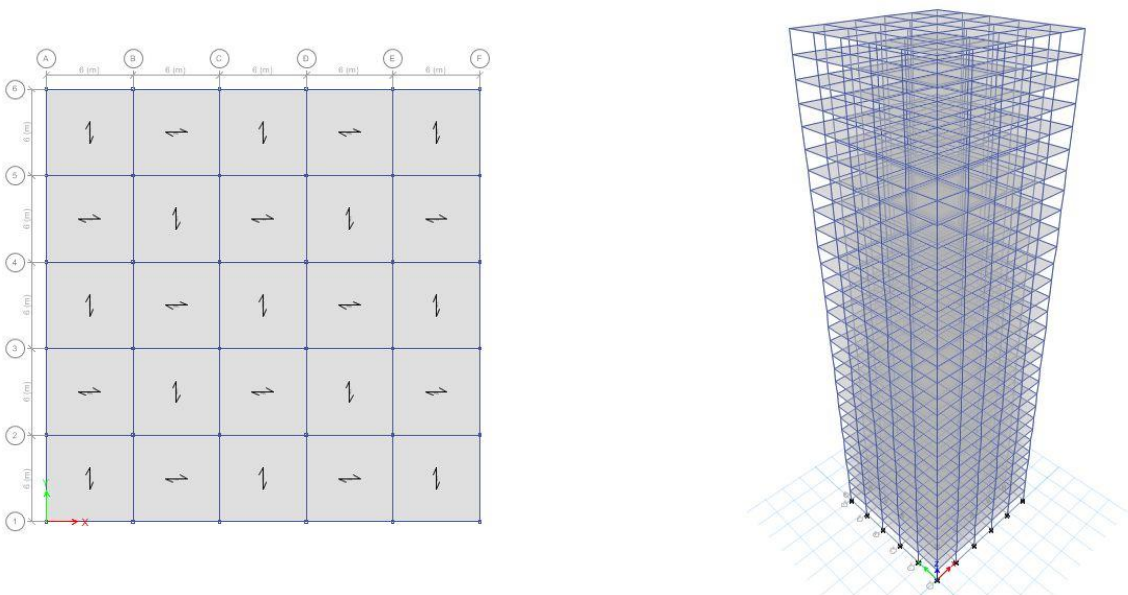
Three-dimensional view and floor plan of the 30-story building frame.
